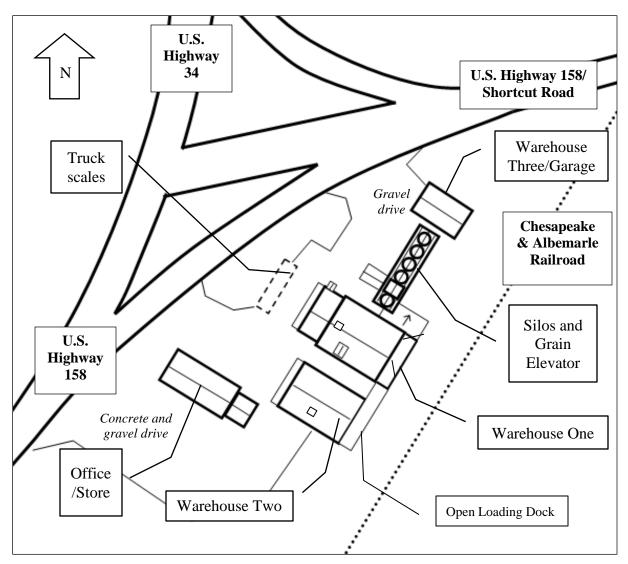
Site Plan for the Tom Sawyer and Sons Complex, Not Drawn to Scale.
